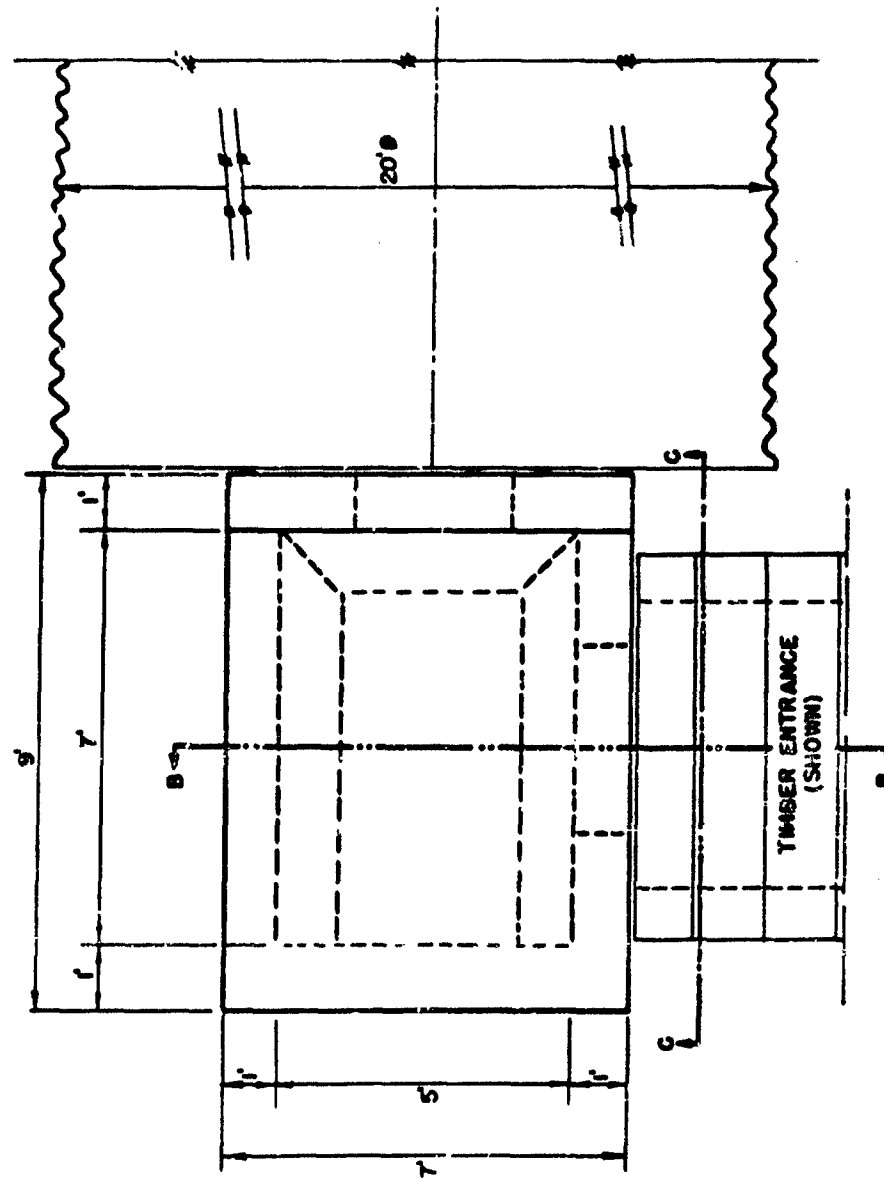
Exterior walk-through door foundation; plan with earth cover removed.
